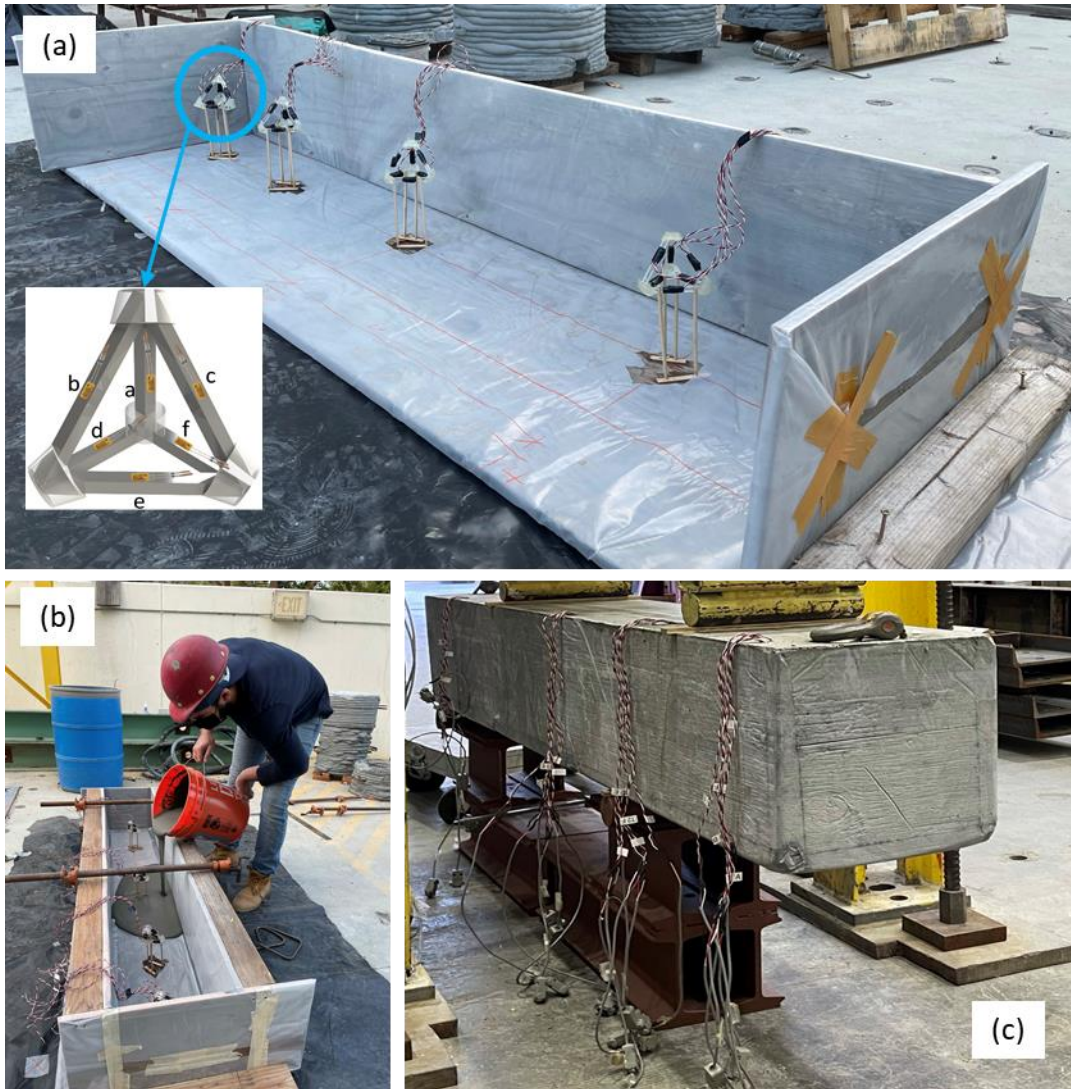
(a) affixed tetrahedra inside the beam formwork; (b) concrete pouring; and (c) cured completed beam
